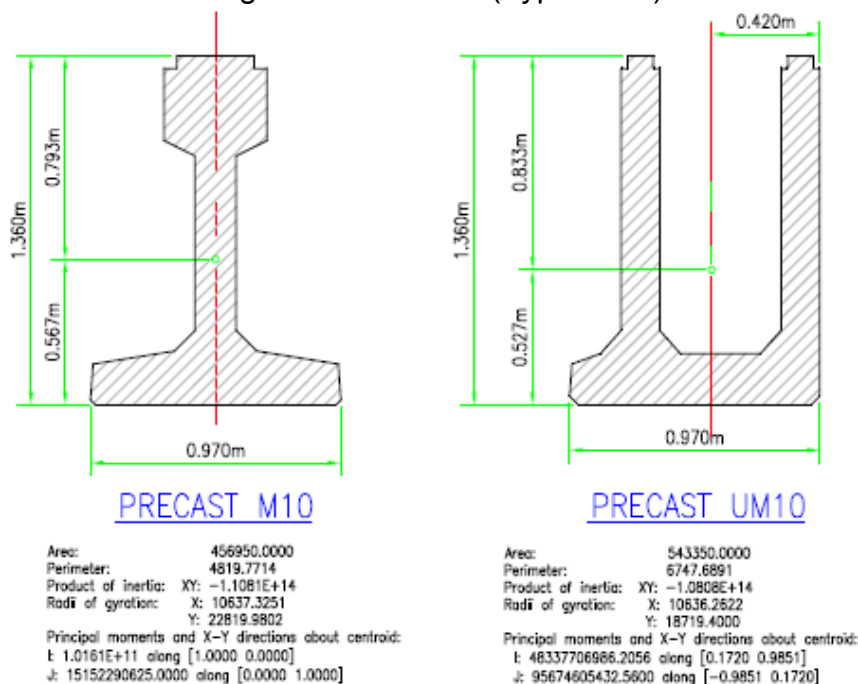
Pier P-33 (Type P1-A) precast beam section properties
